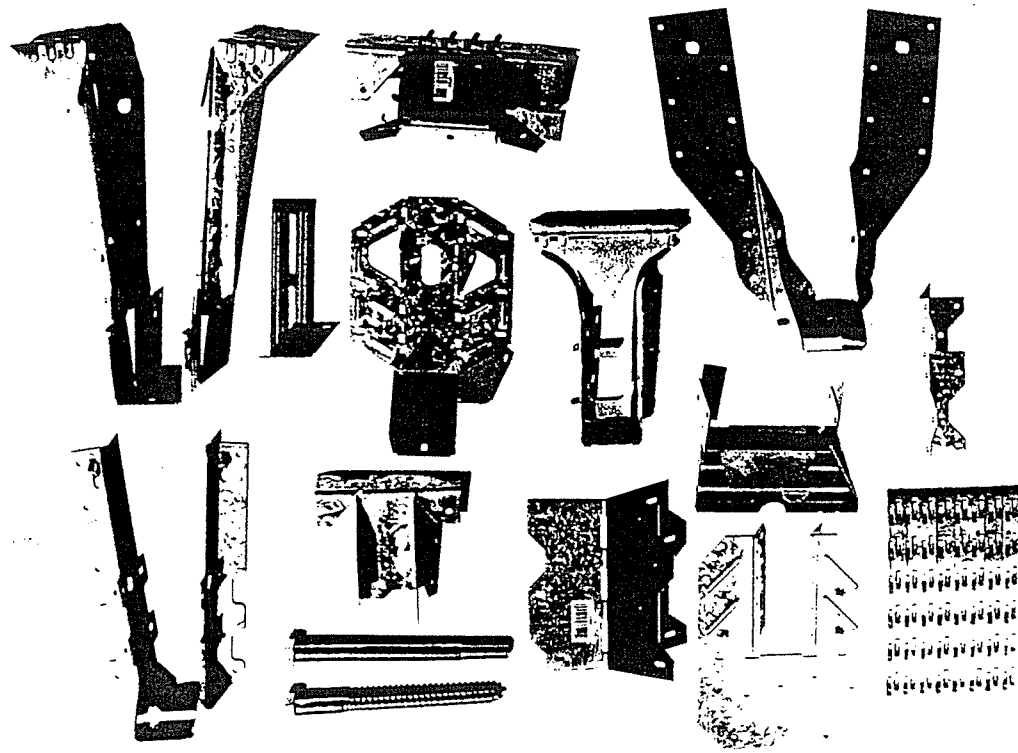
Teaching Tool Package: metal connectors and fasteners.
